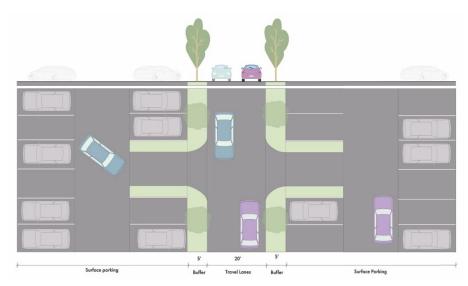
Mixed-use/multifamily parking lots on secondary streets.
